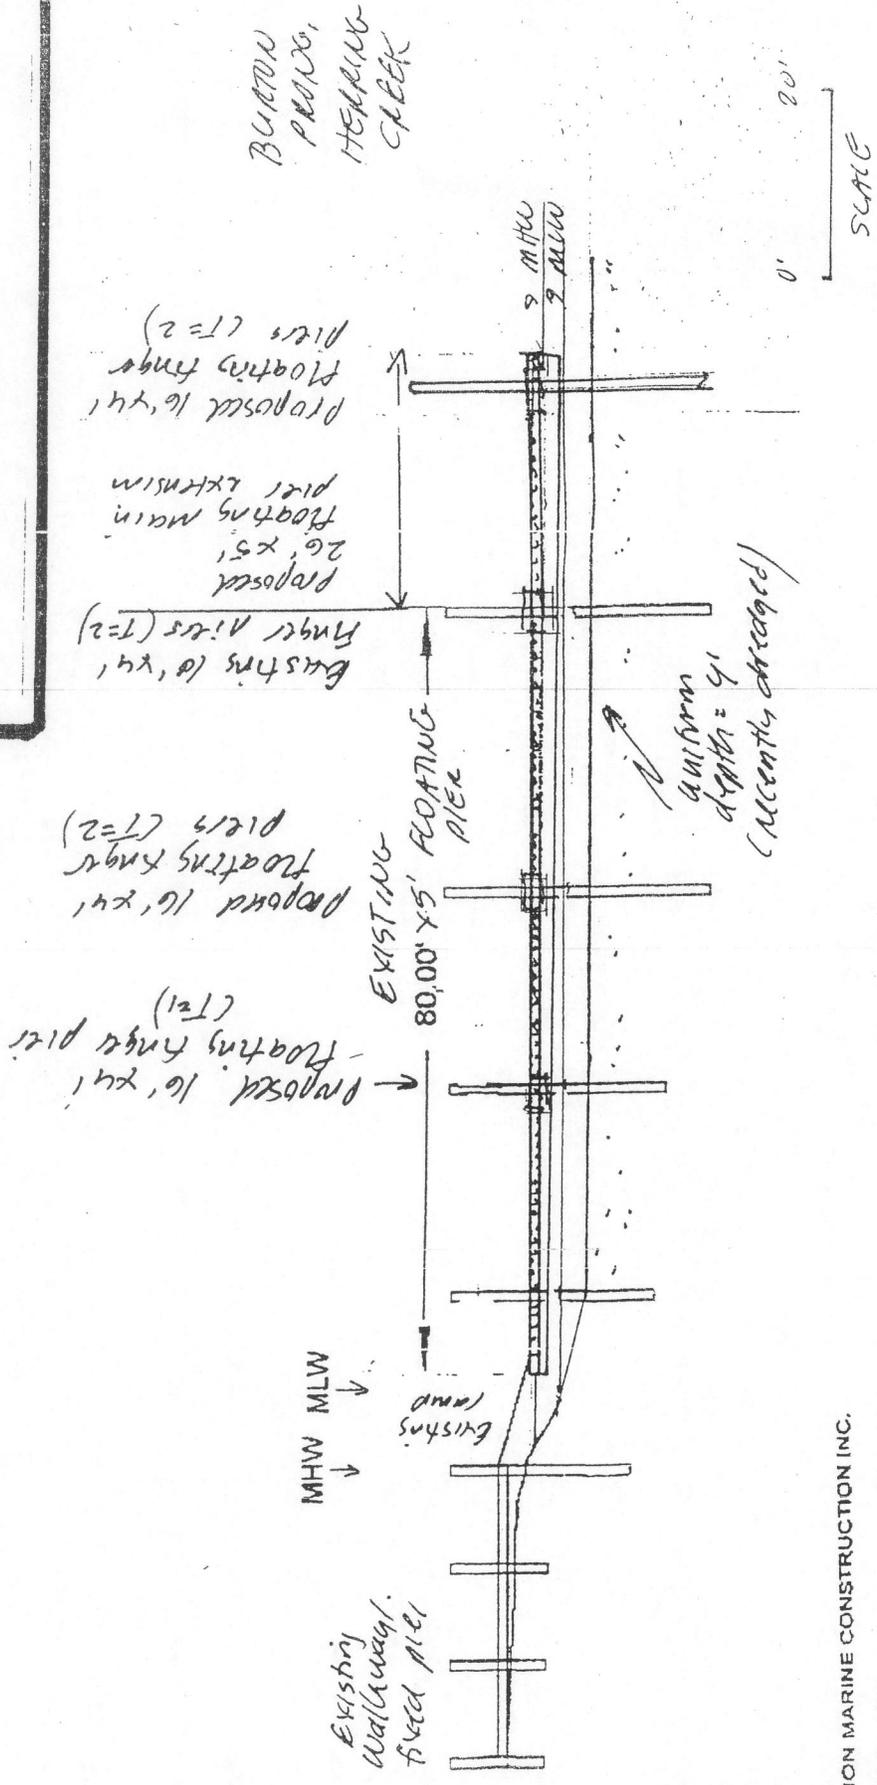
Plan view showing existing structures (cross-hatched), and proposed addition, one 26' x 5' floating main pier extension and five (5) 16' x 4' floating finger piers to provide ten (10) additional slips. (Plan prepared by Precision Marine
